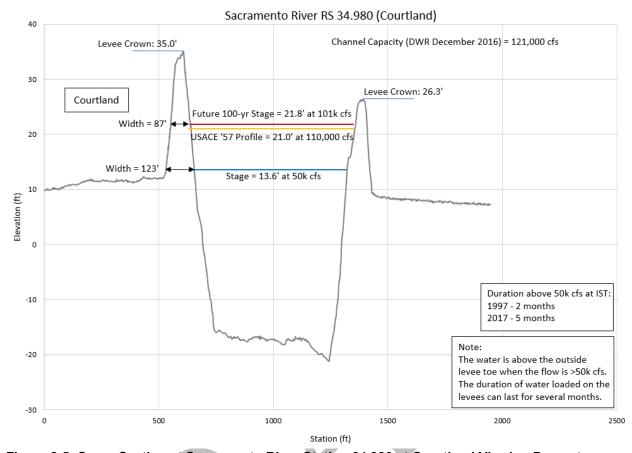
Cross Section at Sacramento River Station 34.980 at Courtland Viewing Downstream
